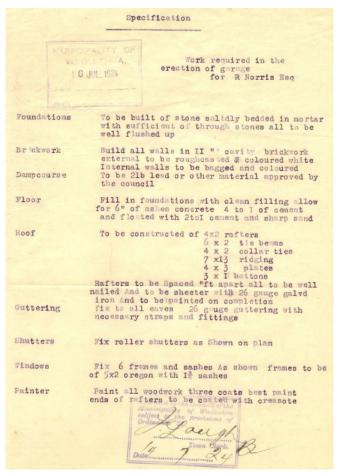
Specifications submitted with BA. (Source: BA352/24)
